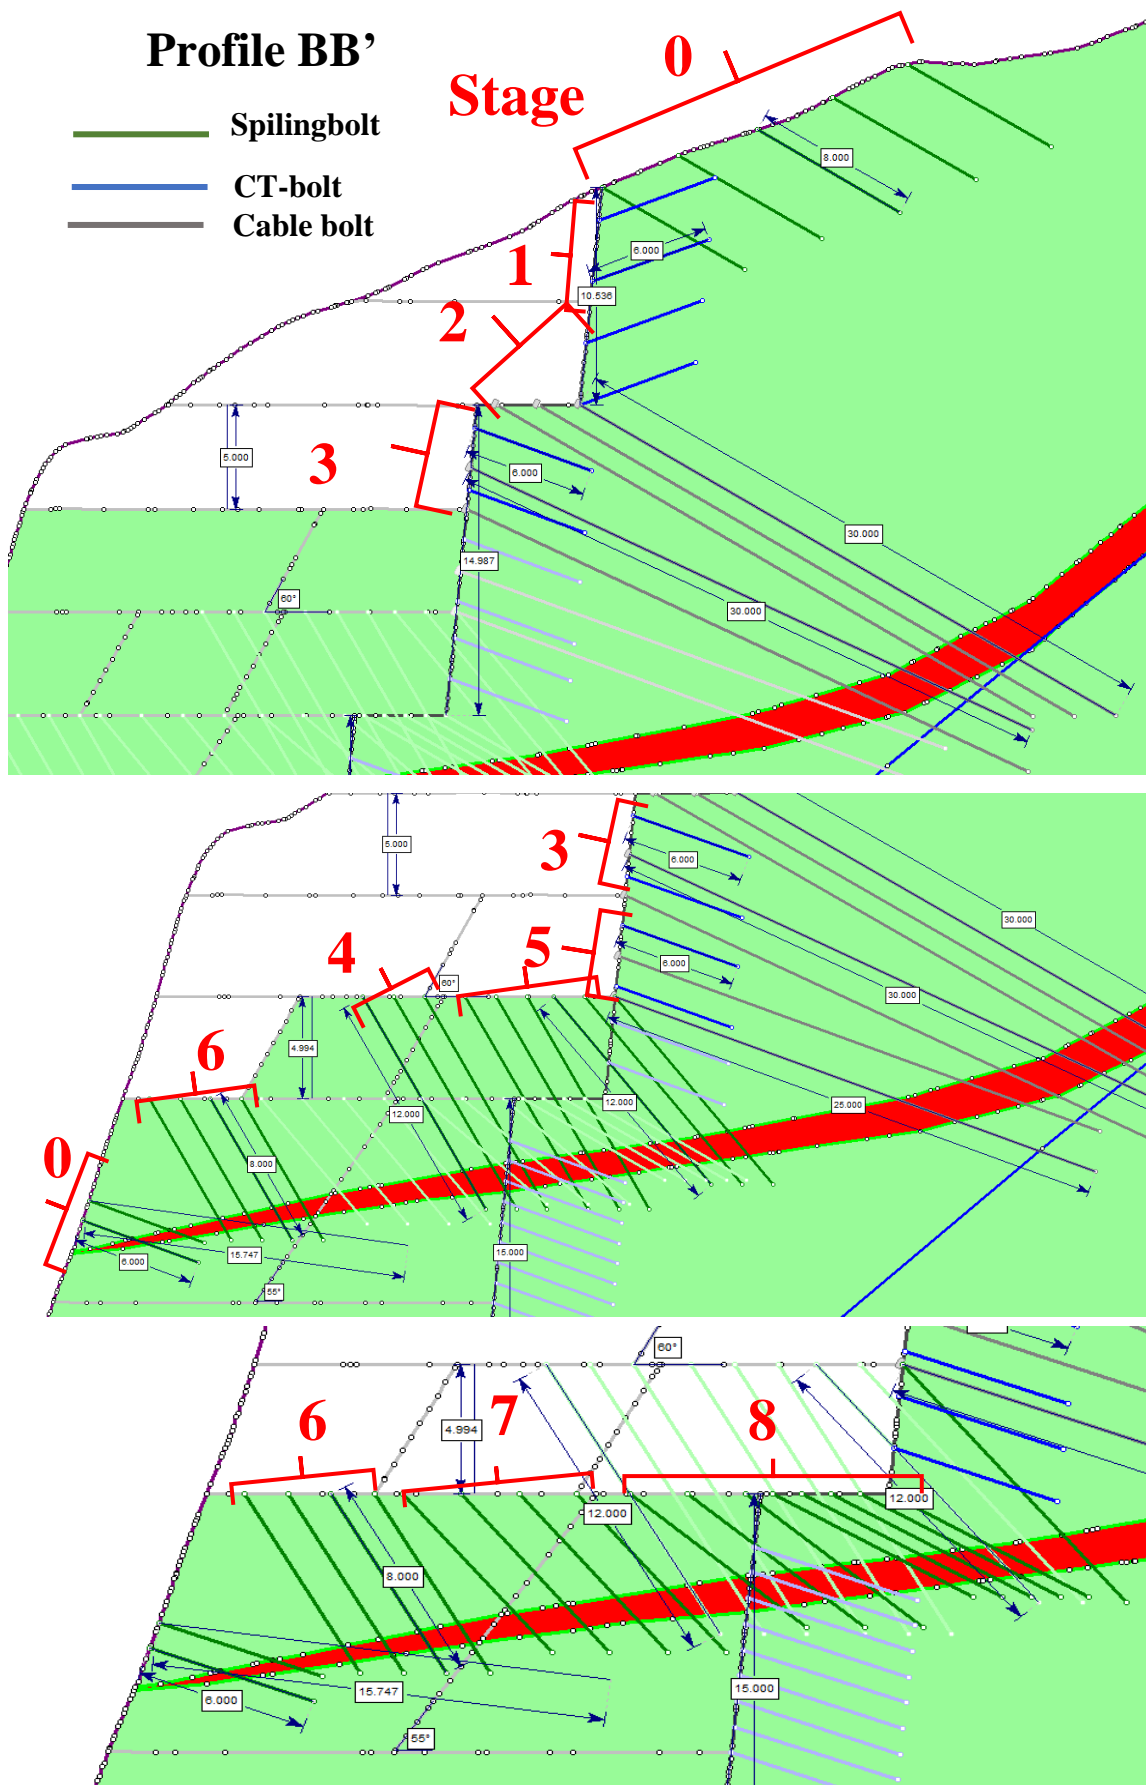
Excavation stages and corresponding installation stages for the stability measures at profile BB'. Spiling bolts longer than 8 m are in reality Ischebeck self-drilling rock anchors [1/2].
